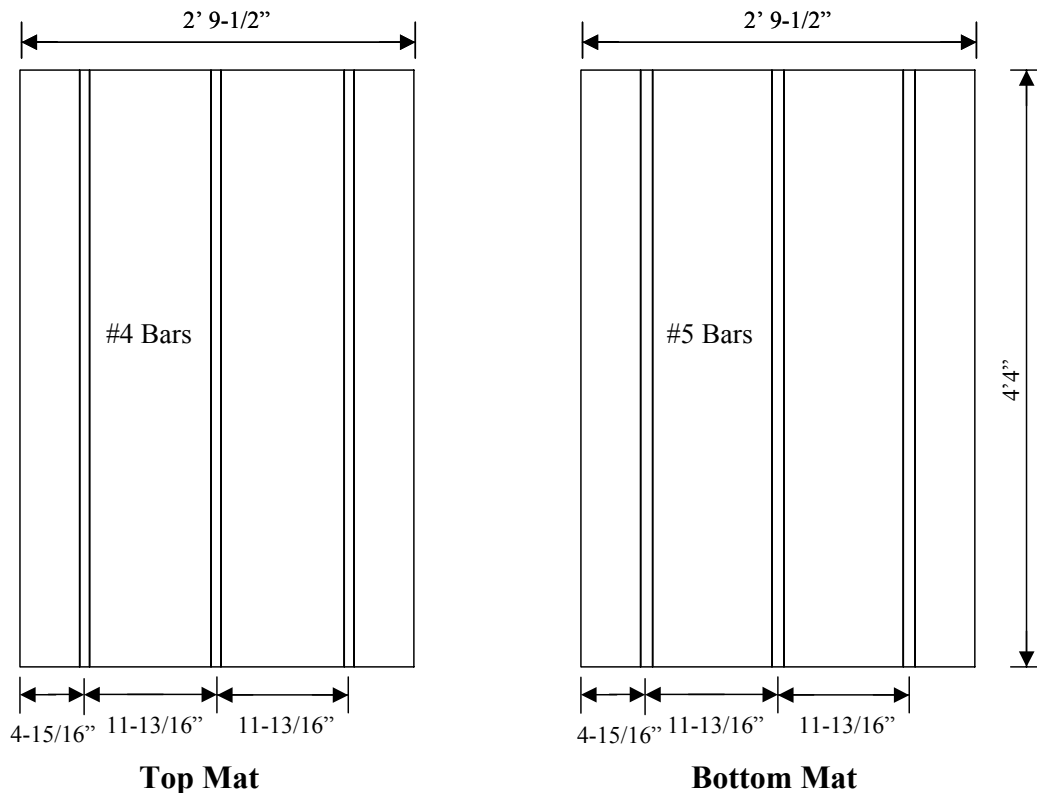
Plan View of Specimens 1 and 7 Reinforcement
